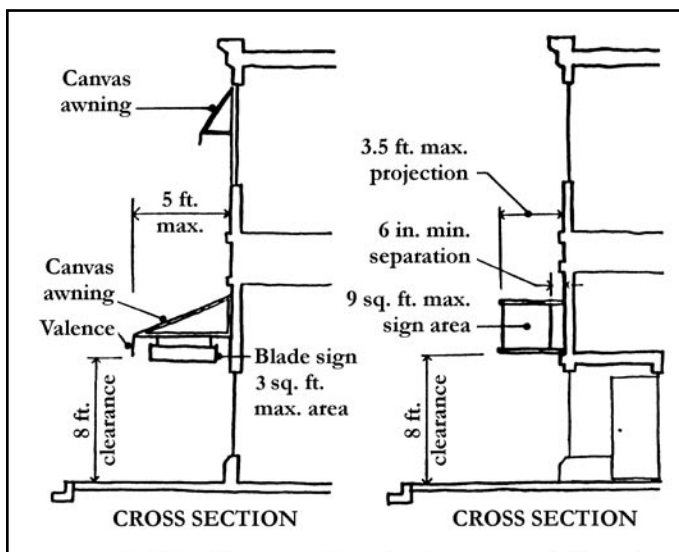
Cross-sections of commercial building facades, showing maximum dimensions for awnings, blade signs, and projecting signs
